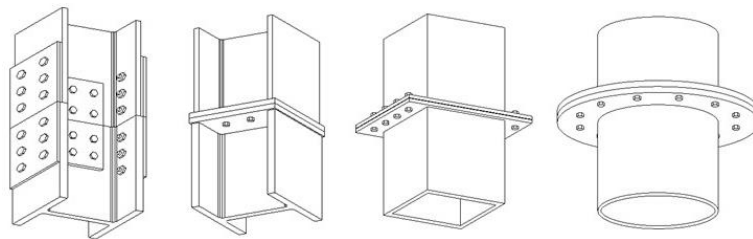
Typical splice connections in steel structures (image credit: SteelConstruction.info) [12].
